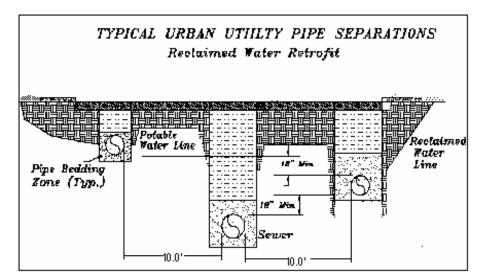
Standard horizontal pipe separation new construction detail of reclaimed water in developed utility corridor
